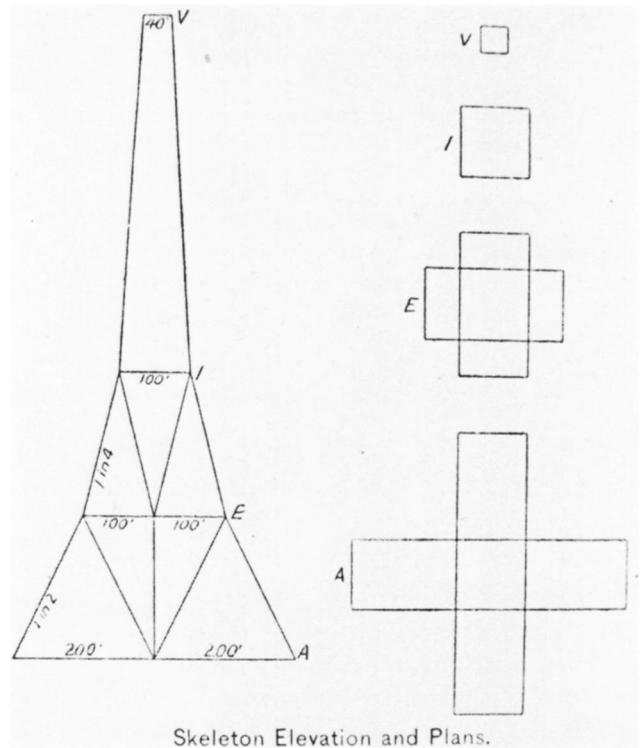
George S. Morison, Skeleton elevation, tower project for the Columbian Exposition, 1891 (*Engineering News*, December 1891).
